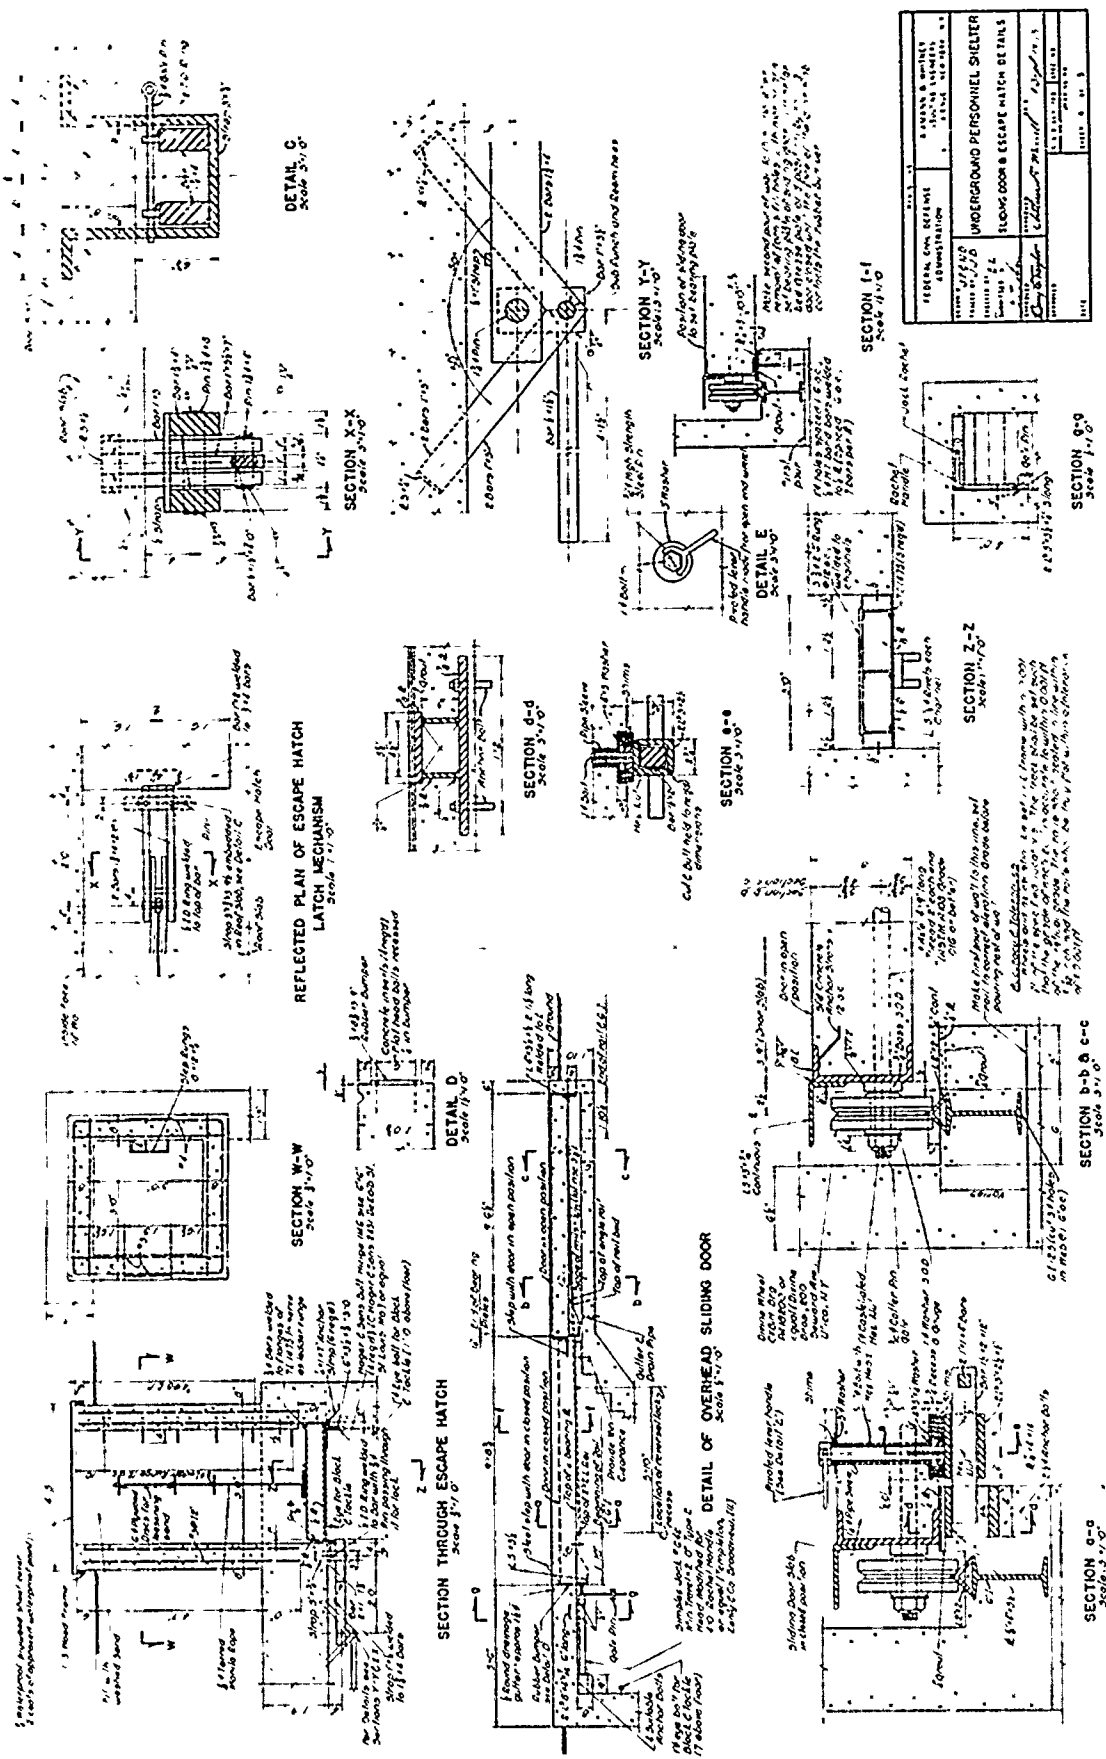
Sliding door and escape-hatch details, underground personnel shelter.
